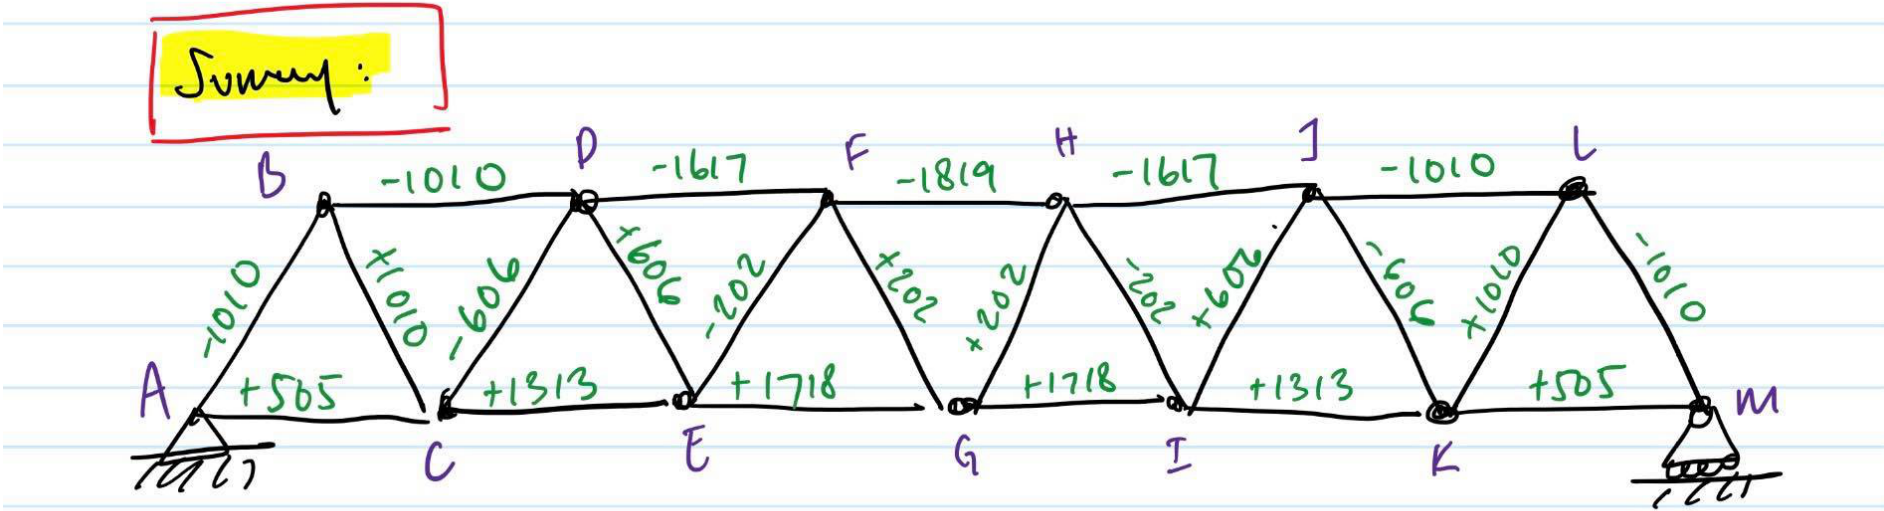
Truss Bridge solved from CIV102 Assignment 5.
